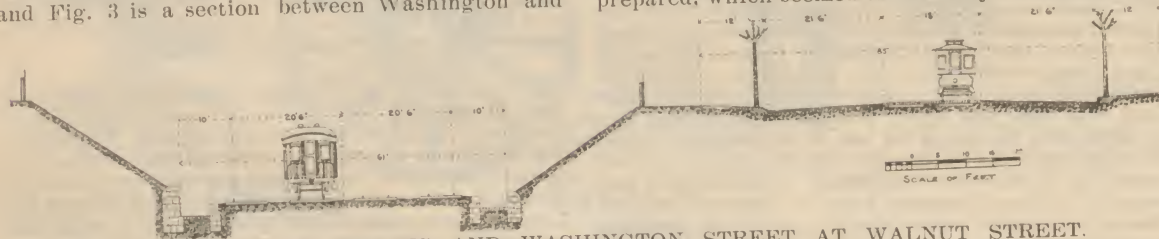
SECTION OF TRACKS AND WASHINGTON STREET AT WALNUT STREET.
